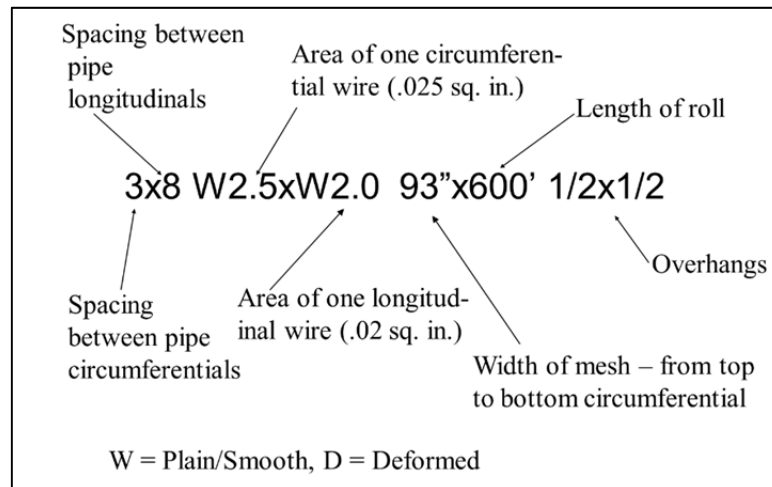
Description of welded wire fabric dimensions.
